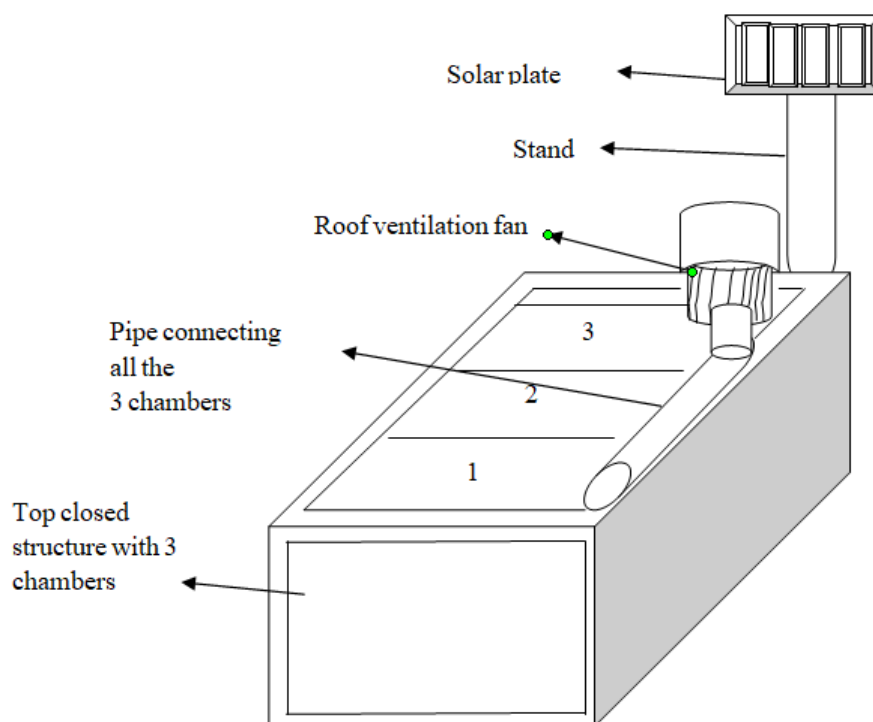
Solar Roof Ventilation Installed for Many Chambered Structure
